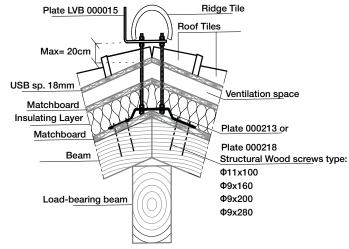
Cross-section of the LVB device fixed with a ridge beam load distribution plate on a wooden support structure.
